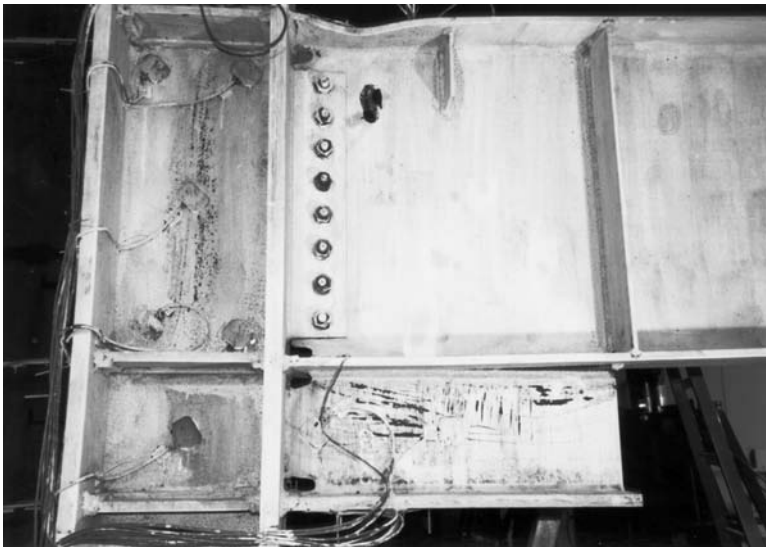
Fracture between straight haunches and beam bottom flange at the free end of the haunch and beam top flange local buckling.
